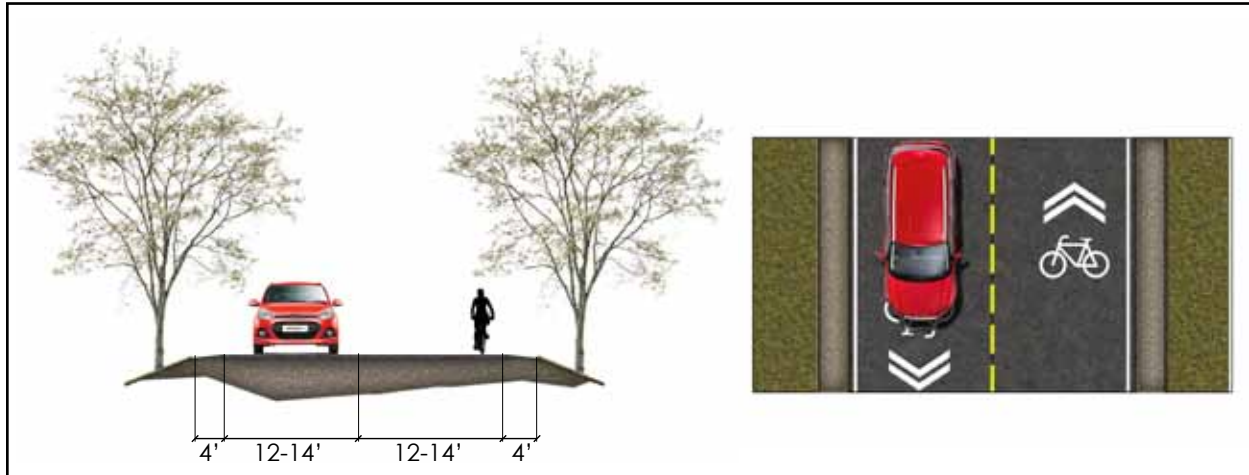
Typical cross section (left) and plan view (right) of a sharrow.
